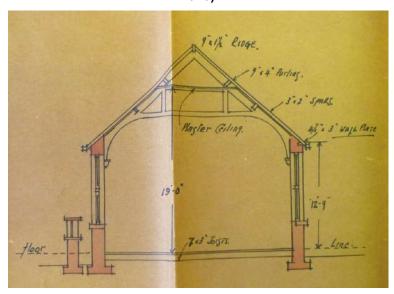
South-facing cross-section from the original drawings of 1923 (CAC(K) WS/RD/SW/Plan 107 1923)
